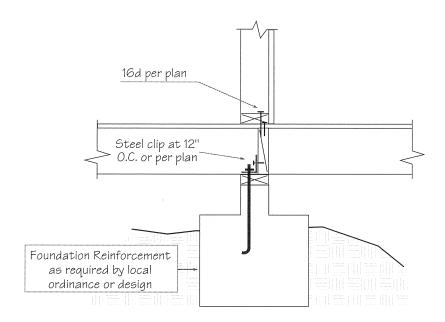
DETAIL K ~ THROUGH-FLOOR SHEAR-WALL CONNECTION WITH SOLID - SAWN FRAMING
